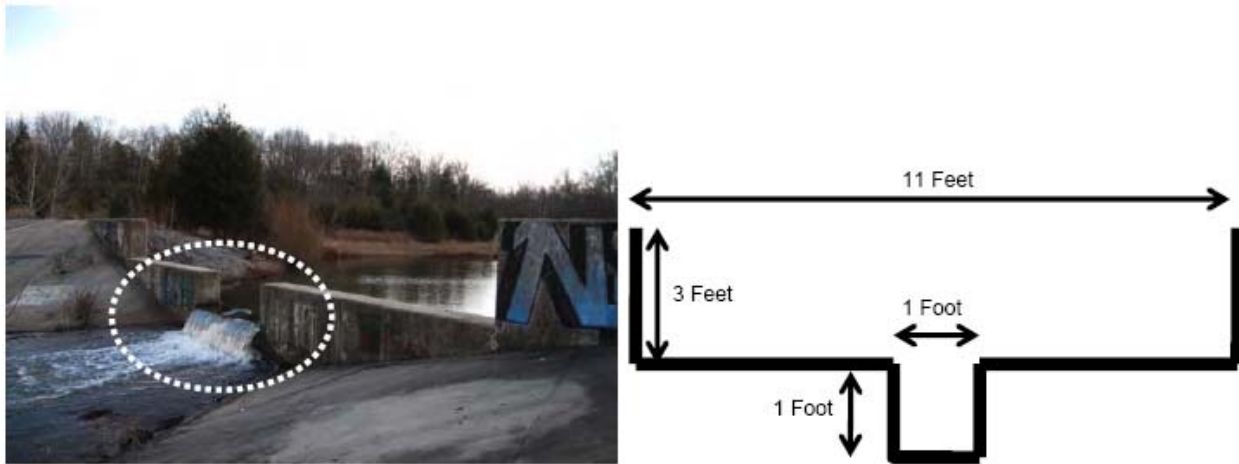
Ukrainian Village Pond - Proposed Outlet Structure Modification
